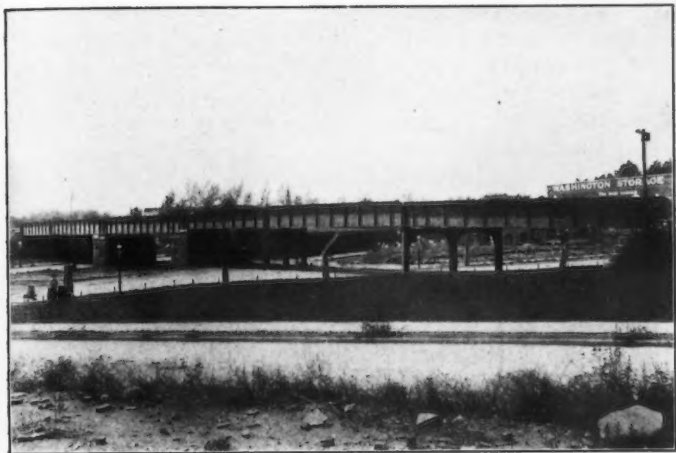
WASHINGTON TERMINAL STATION: STEEL VIADUCT OVER SOUTH CAPITOL STREET.
